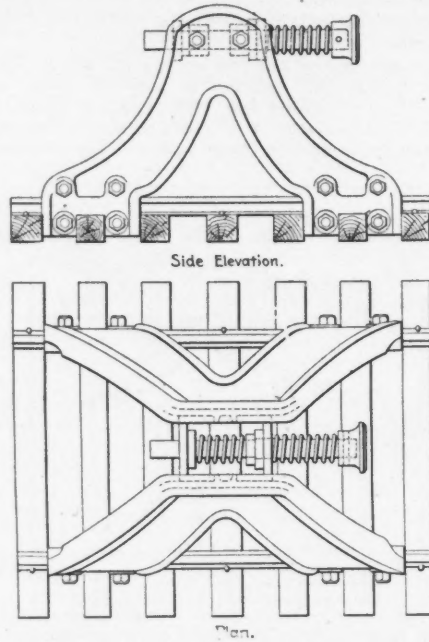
Elevation and Plan of the Haley Bumping Post. The King & Andrews Co., Makers.
